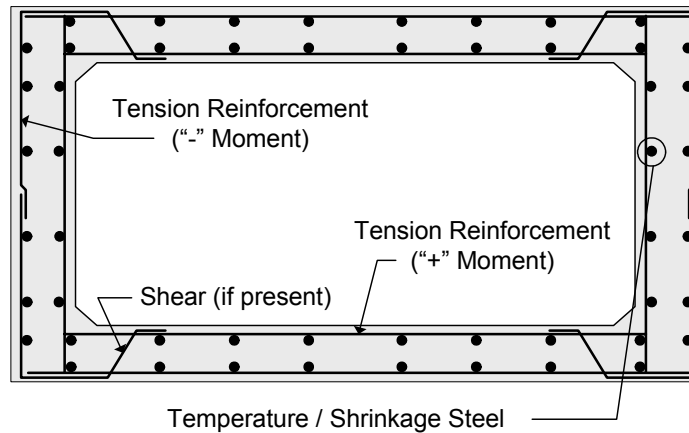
Steel Reinforcement in a Concrete Box Culvert
